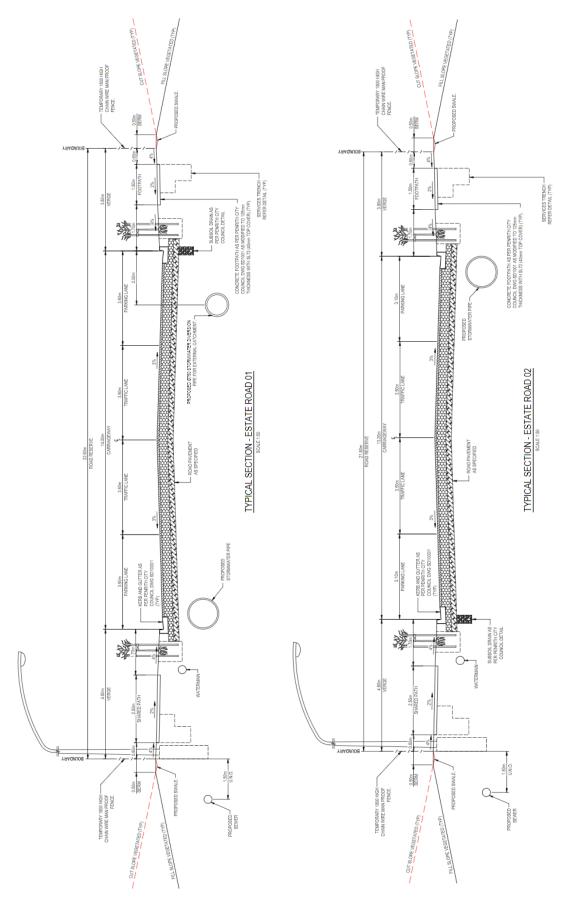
Typical section – Estate Road 01 (top) and Estate Road 02 (bottom) Source: AT&L
